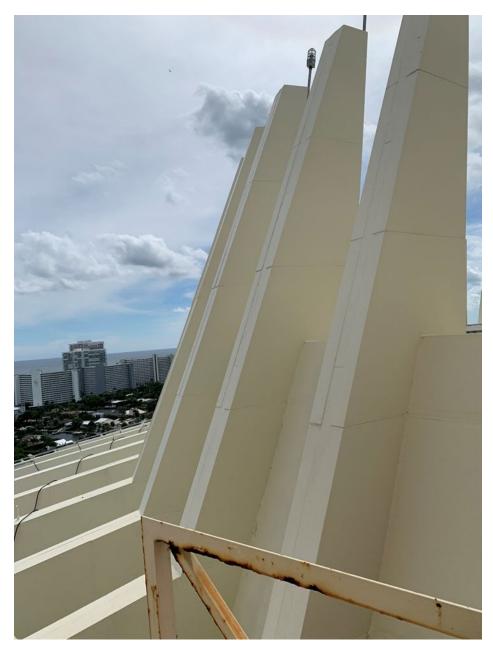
Pier 66 Hotel Tower. Crown: vertical fins. Camera facing southeast. Photograph taken October 18, 2022.
